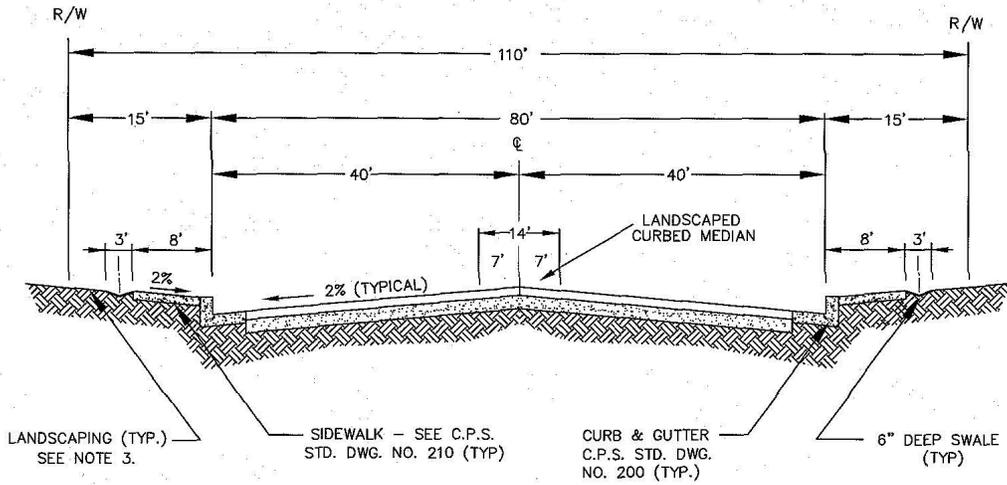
CITY OF PALM SPRINGS GENERAL PLAN ROADWAY CROSS-SECTIONS (SHEET 2 OF 2)
